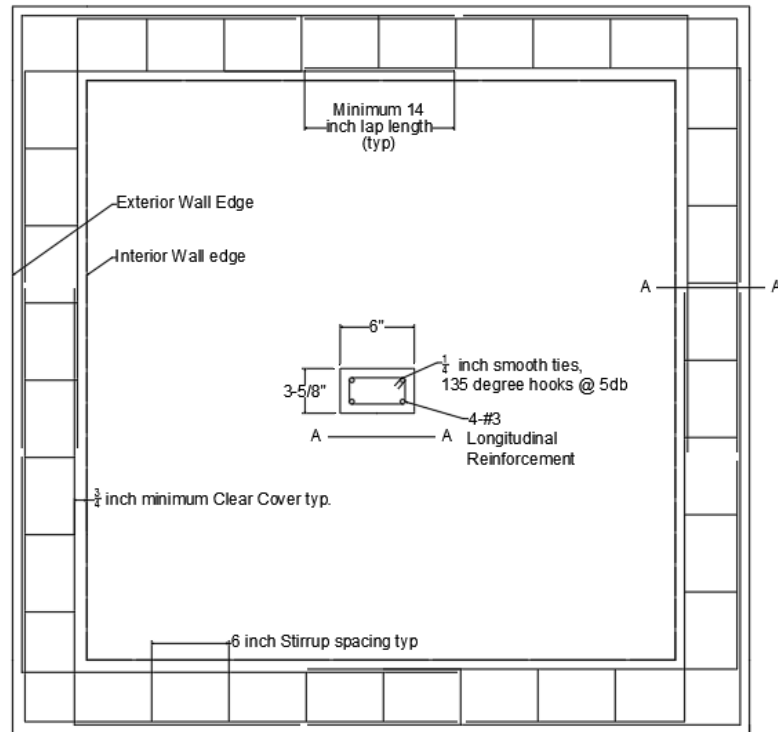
Reinforcement layout for concrete beams and columns used on both confined masonry and masonry infill walls
